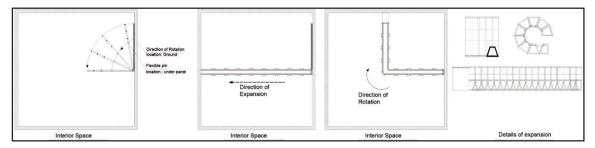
Location, Rotation, movement and detail of wall expansion
